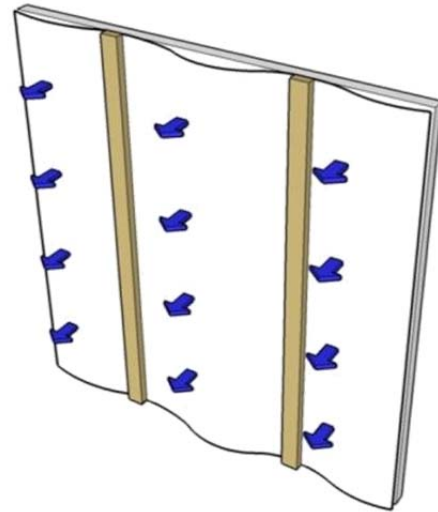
Supported Sheathing Membrane Approach with Vertical Strapping/Girts. Exterior sheet air barrier membrane with vertical wood strapping or metal girts more evenly distributed loads and deflection of the membrane. There is very little test data available to allow for a more analytical or even empirical approach to the determination of structural adequacy for sheet membrane barrier systems. Precautionary measures could include tightly spaced strapping to secure the membrane and selection of more robust membrane, with respect to both strength and tear-resistance. The use of self-adhered and liquid membranes basically makes the sheathing and membrane an integral, rigid air barrier material.
